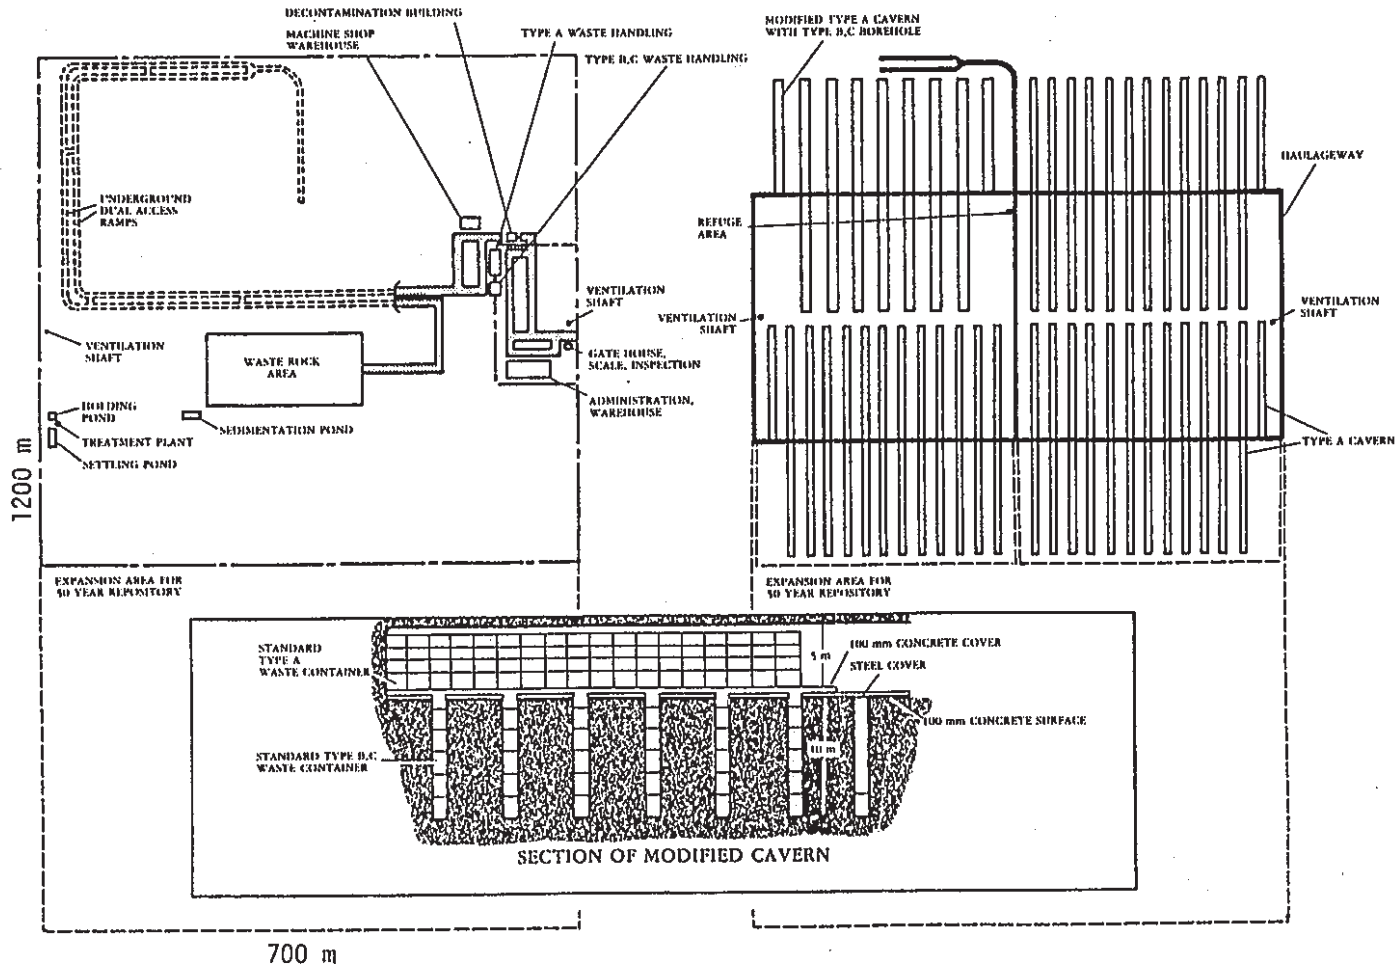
Surface Facilities, Cavern Layout and Design Detail of Caverns for the Shallow Rock Cavern Concept
